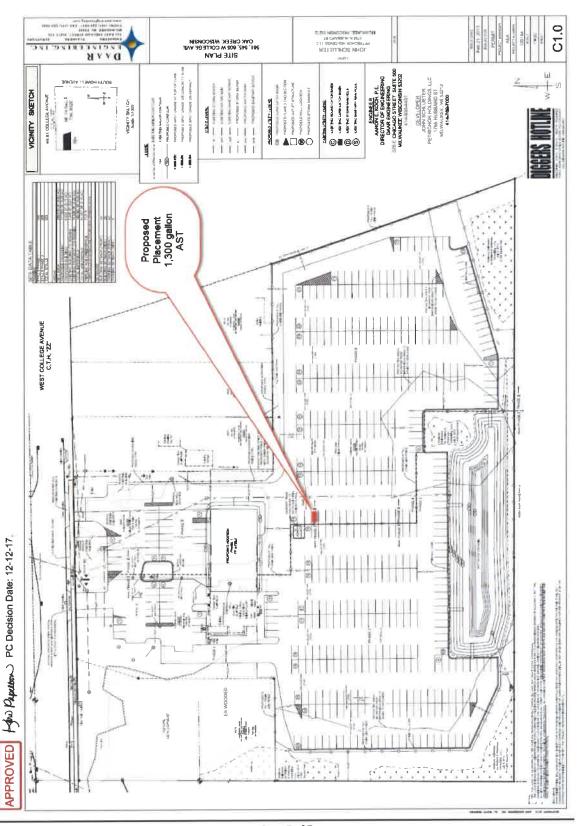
EXHIBIT B: SITE PLAN APPROVED 12-12-17 (FOR REFERENCE)
